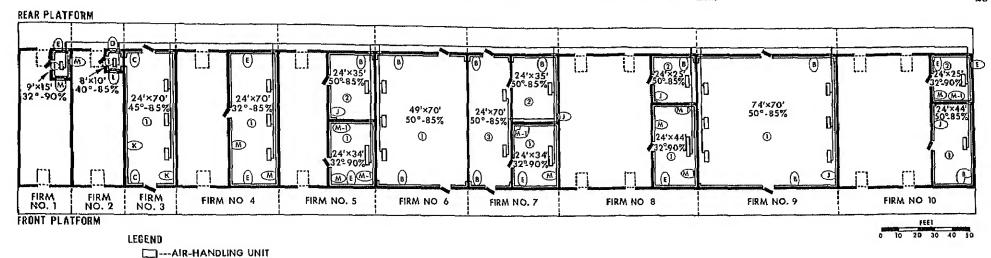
Situation III, Building No. 1 (fresh fruits and vegetables), floor plan and air-handling equipment layout.
